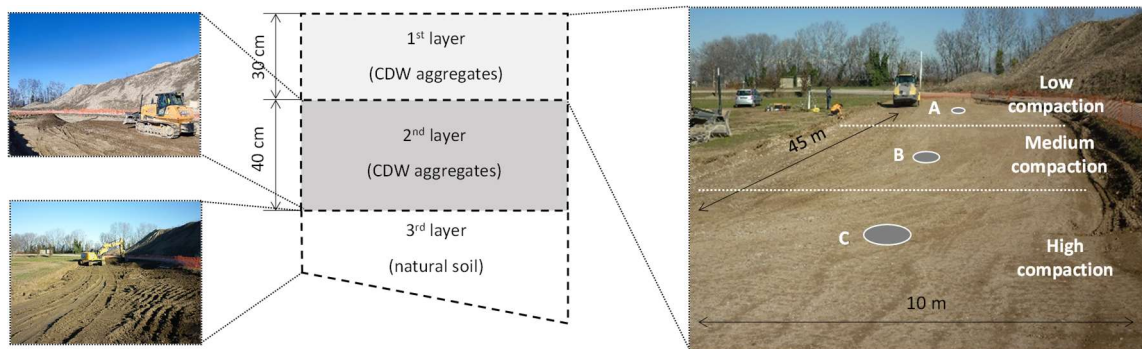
Layout and layered scheme of test pit with indication of compaction sections and testing points.
